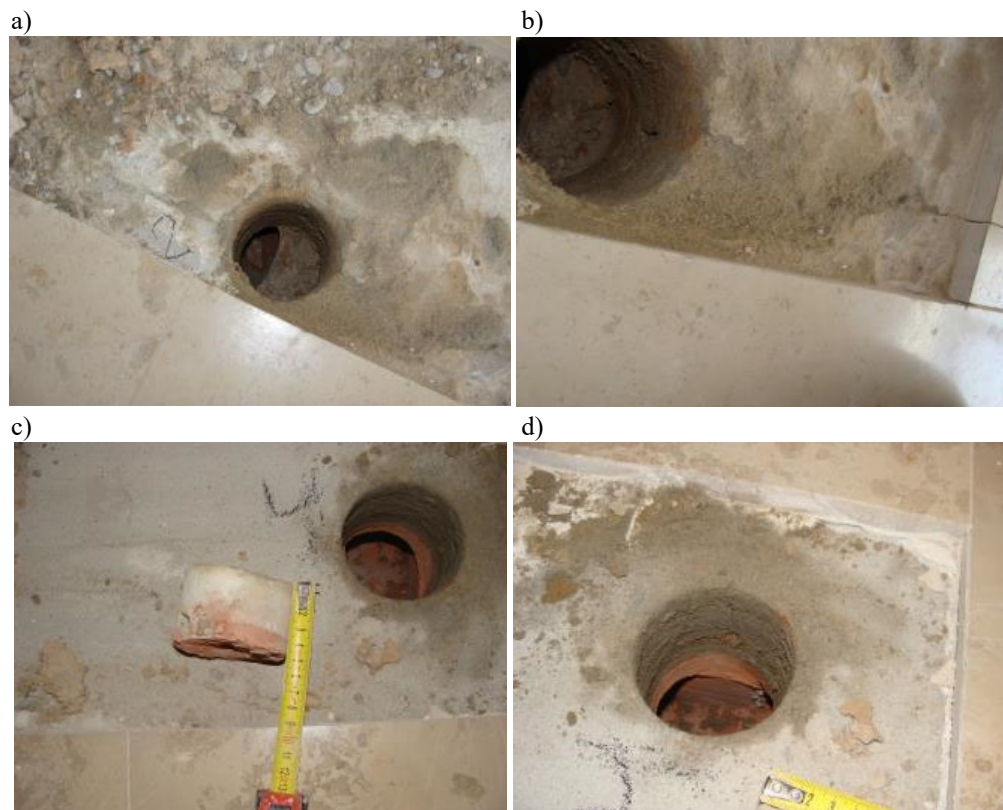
Examples of outcrops from floor layers: a, b) no 2, c, d) no 4
